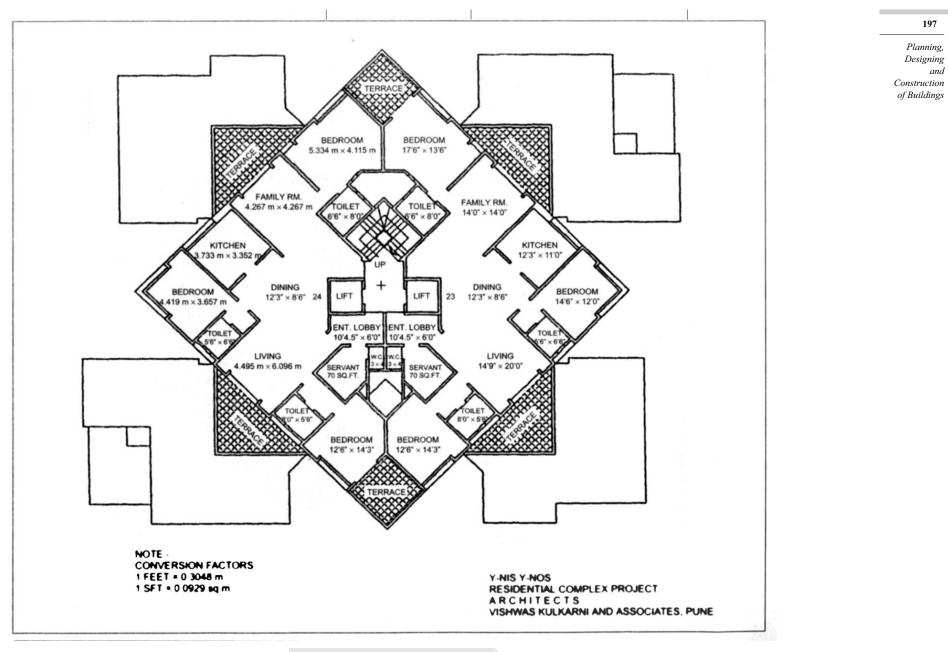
Y-NIS Y-NOS Sixth Floor Plan
